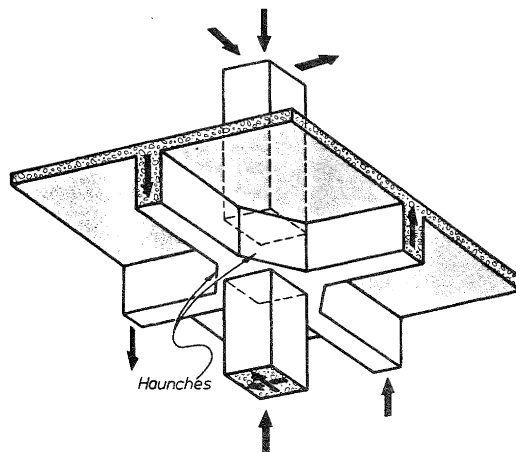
AN INTERIOR JOINT FORMED BY HORIZONTAL BEAM HAUNCHES [35]
